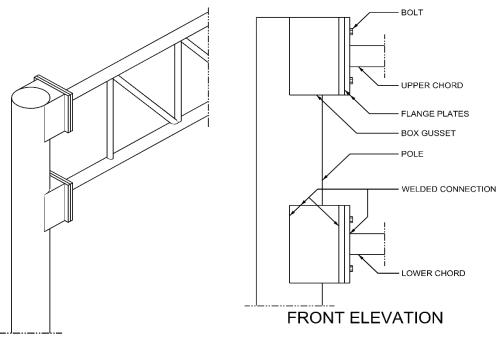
Cantilever Chord to Pole Connection, Gusseted Box Flange Plates
